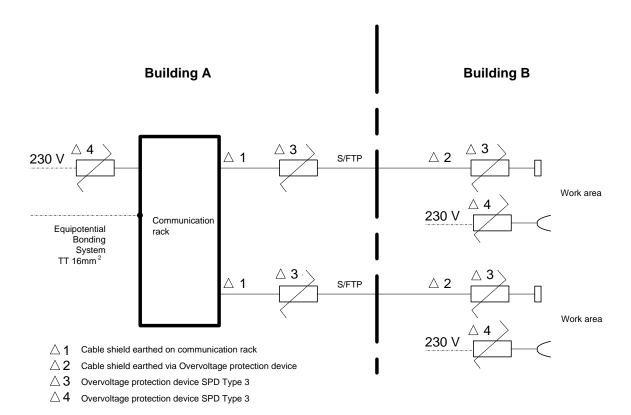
Earthing and overvoltage protection measures for copper connections between 2 buildings.
